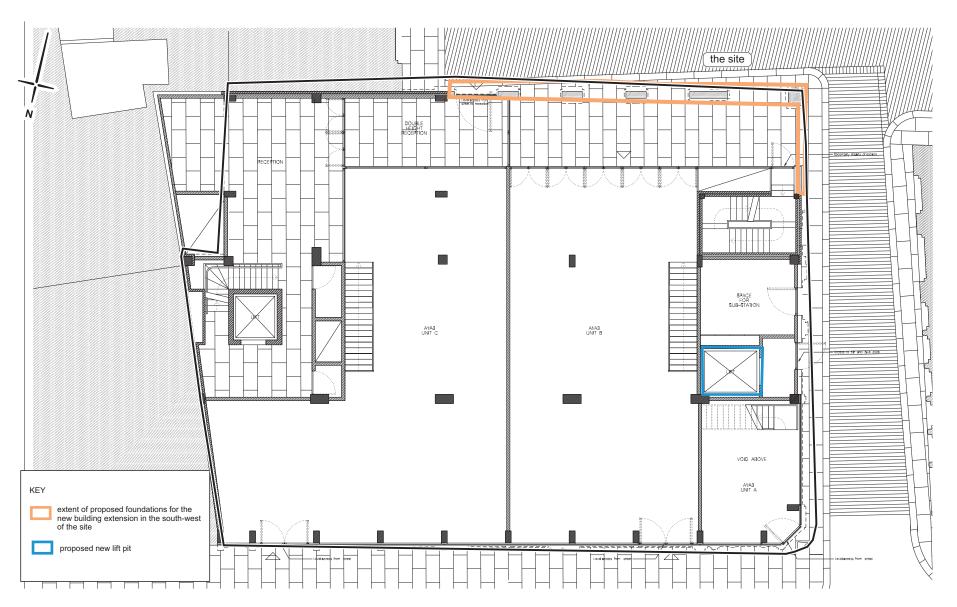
Plan of proposed ground floor, showing the location of new foundations to support the new building extension above ground floor level (Groupwork, dwg. no. 248–501, rev. K, date 08/12/2017)
